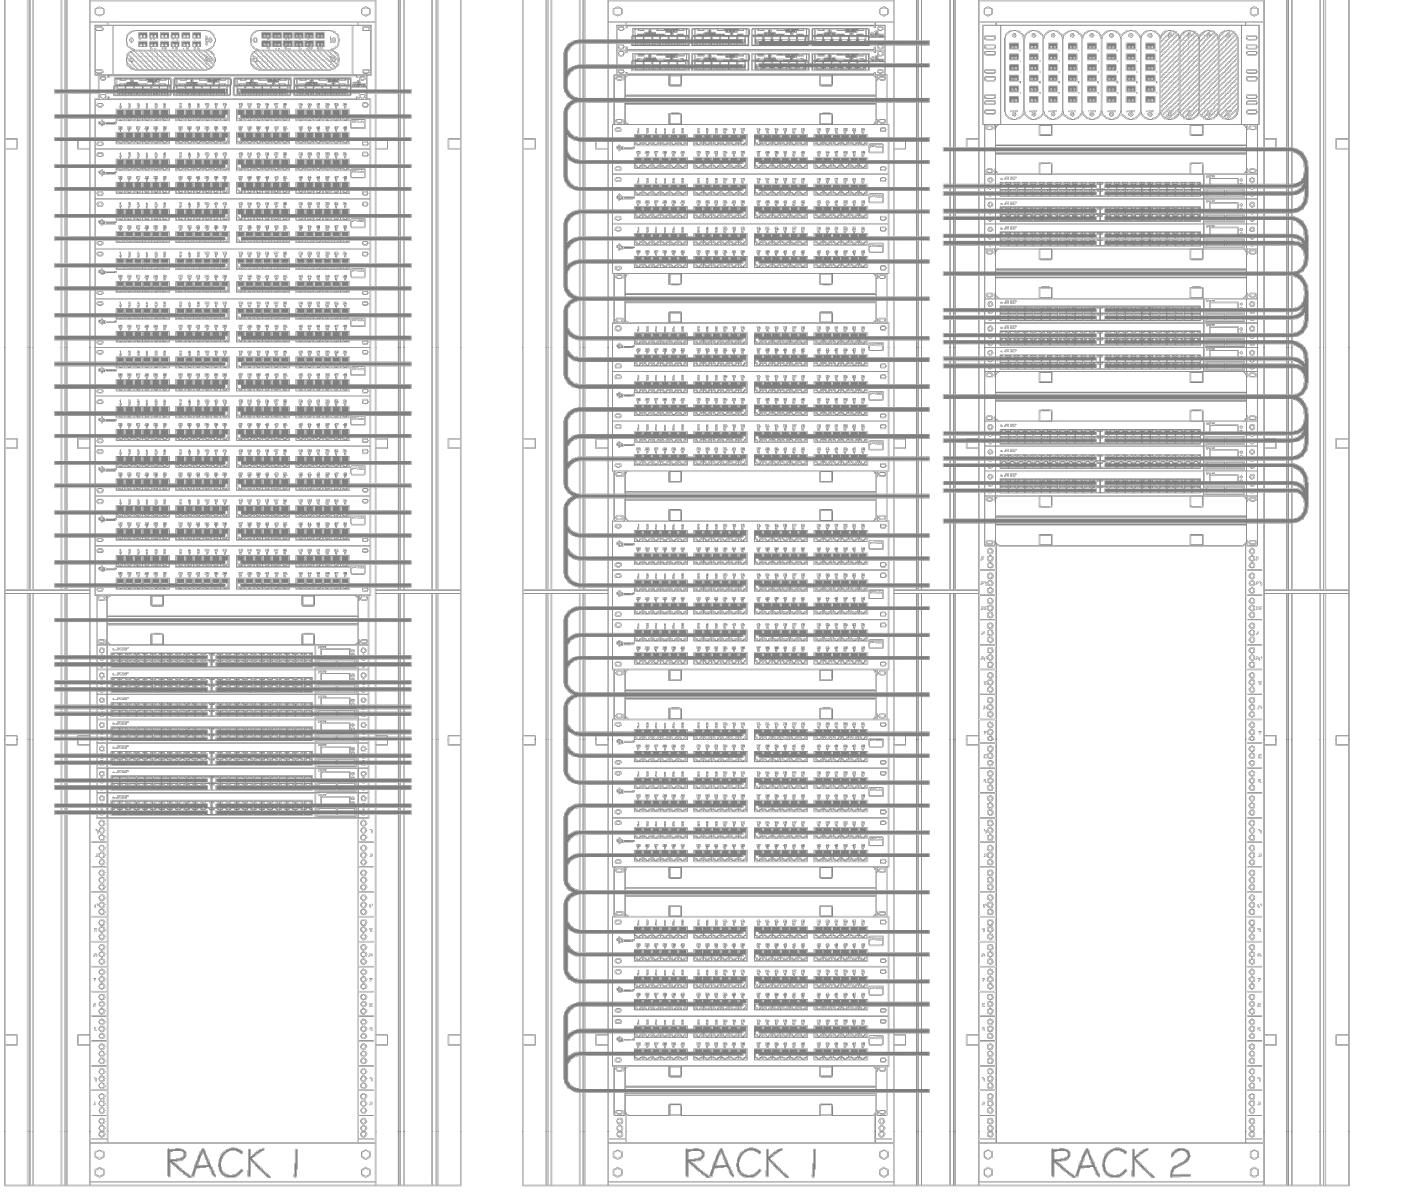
Patch Cable Routing for Single and Double Rack Designs.
